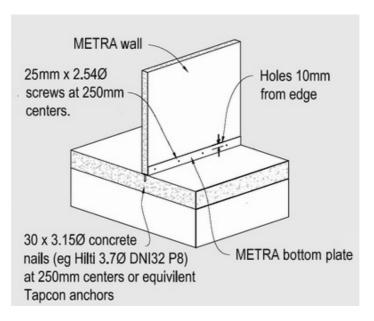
Internal Wall/Floor Fixing - Concrete Floor
